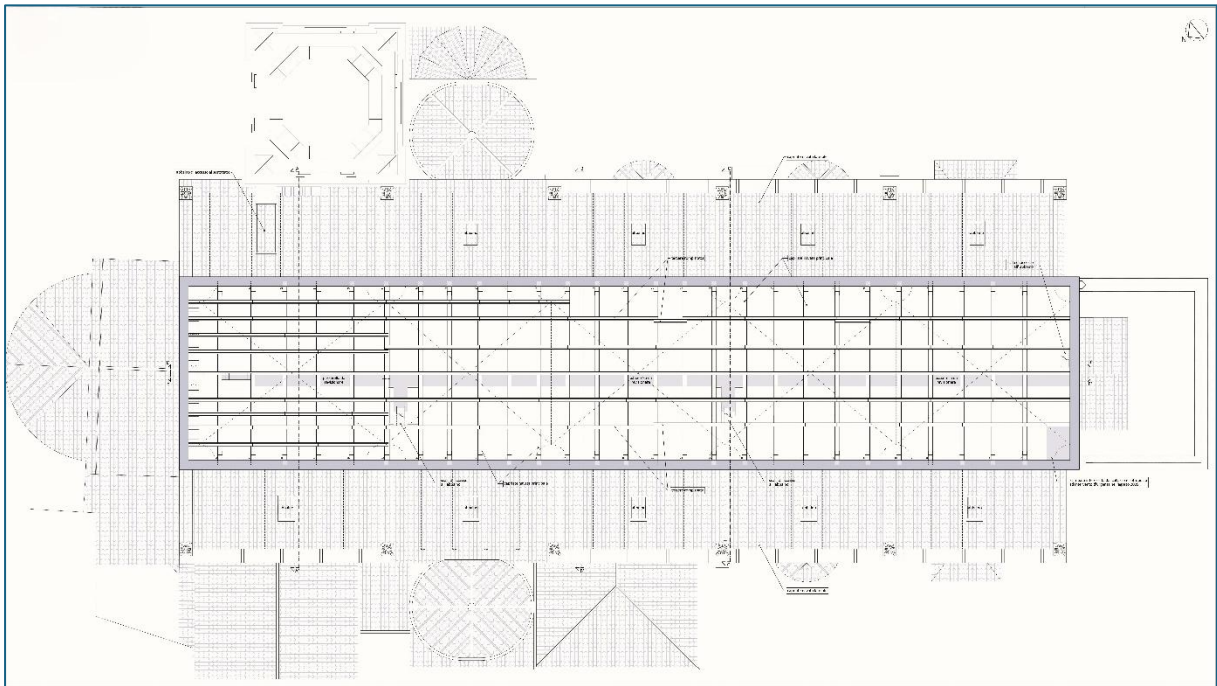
Verona, Cathedral, attic plan with indication of timber trusses. (Source: Arkitet Studio, Verona)
